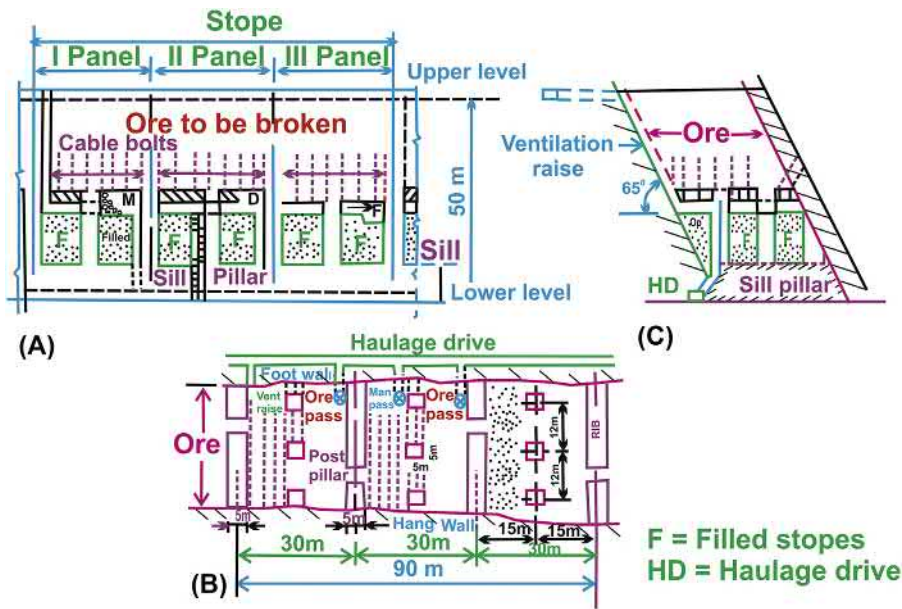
Schematic diagram of flat back cut and fill mining with post pillar stoping at Rajpura-Dariba mine, (A) Longitudinal section, (B) plan, and (C) cross-section. The operation is a cycle of drilling, mucking, and filling.
